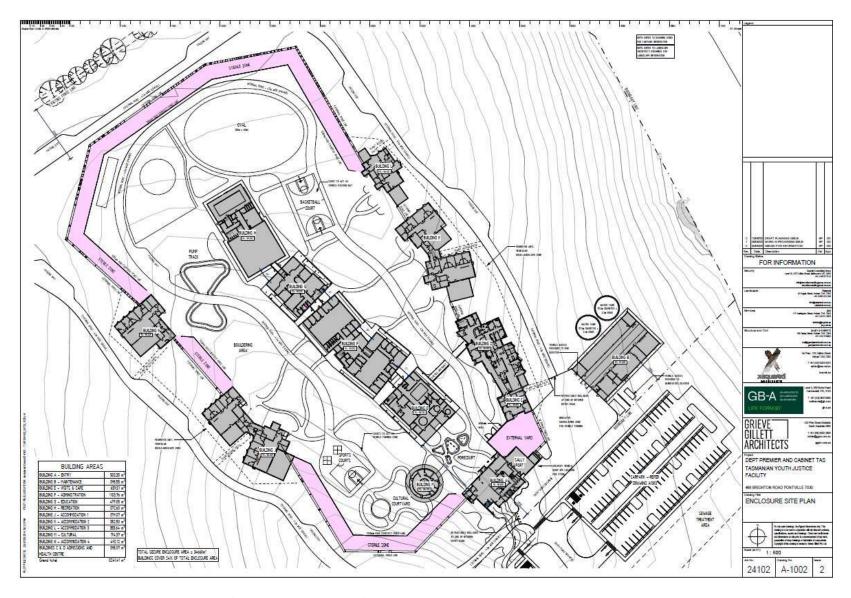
Original design used for the BHMP assessment for the Proposed Tasmanian Youth Justice Facility at 466 Brighton Road, Pontville.
